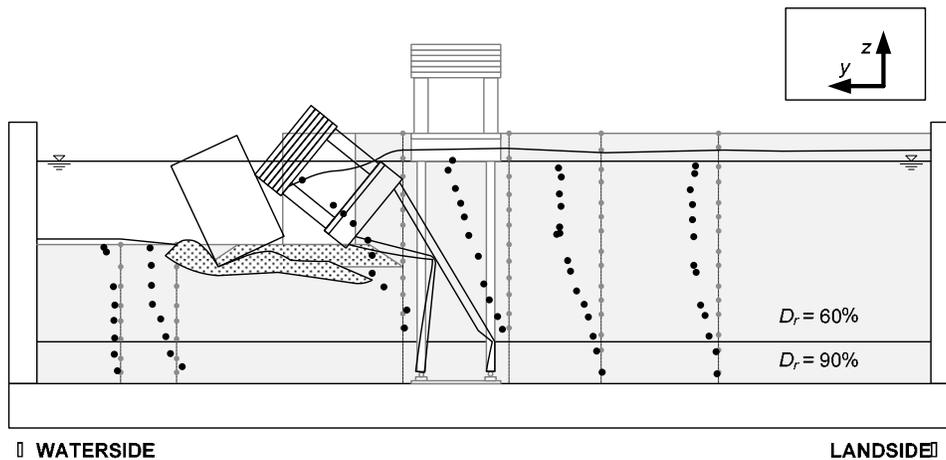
Section of the change of the specimen due to shaking. Gray and black colors indicate the structures and measurement points before and after the test respectively.
